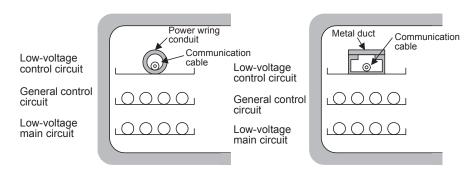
Wiring Using an Underground Pit or Underground Tunnel
